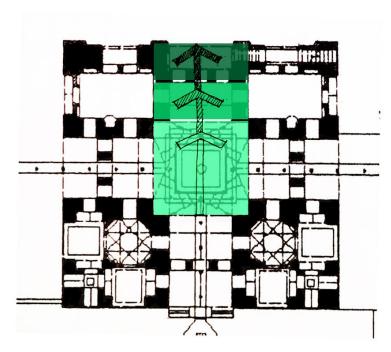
Accompanying layers in depth, plan, Fin Garden.
